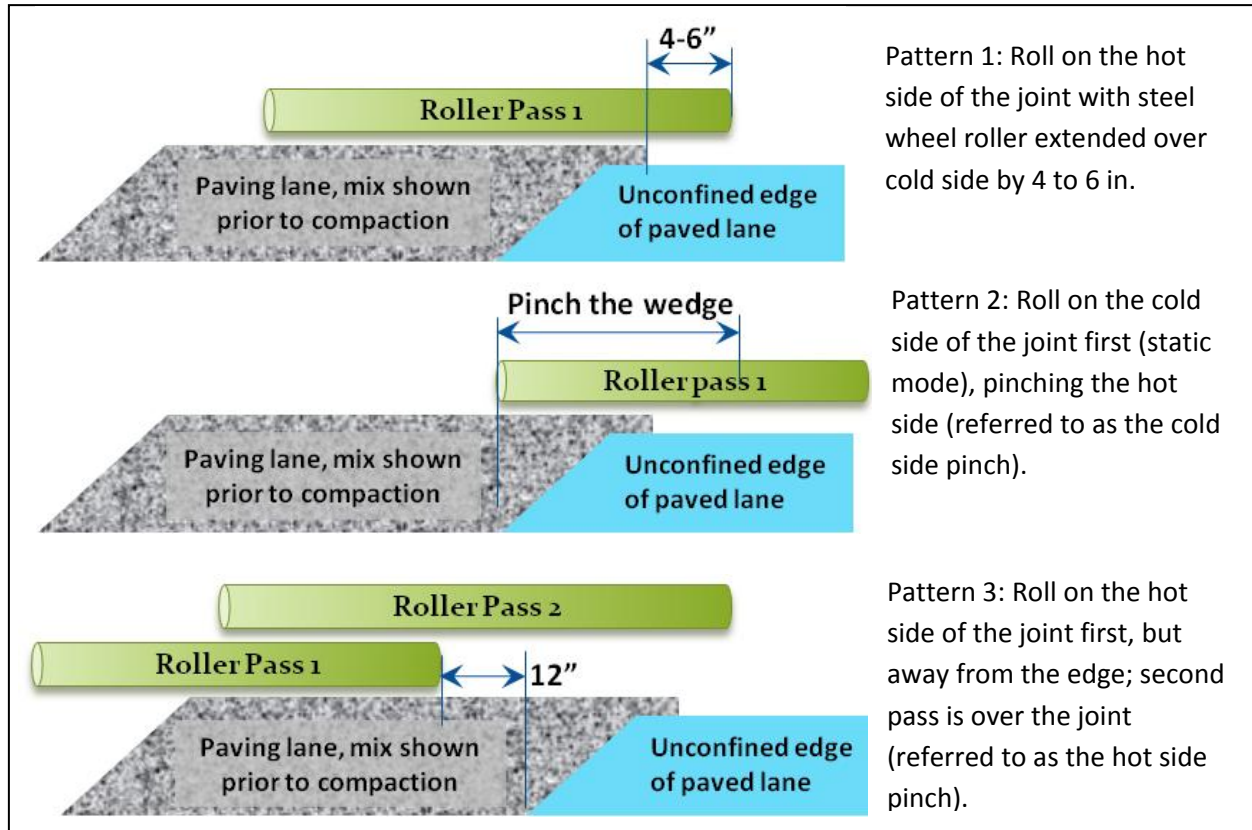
Type of Rolling Patterns for Longitudinal Construction Joint (Steel Wheel Roller)
